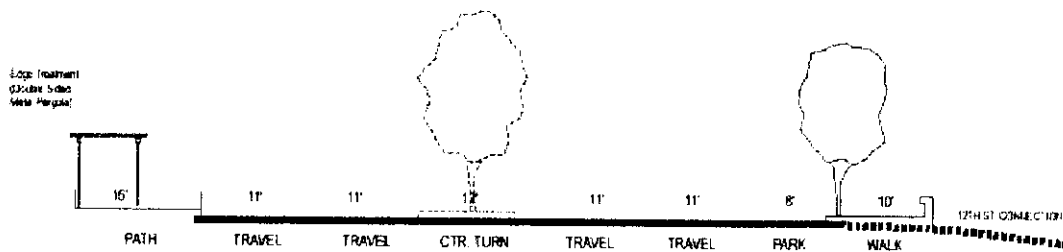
Cross-Section 100 Feet South of 12th Street, Looking North
